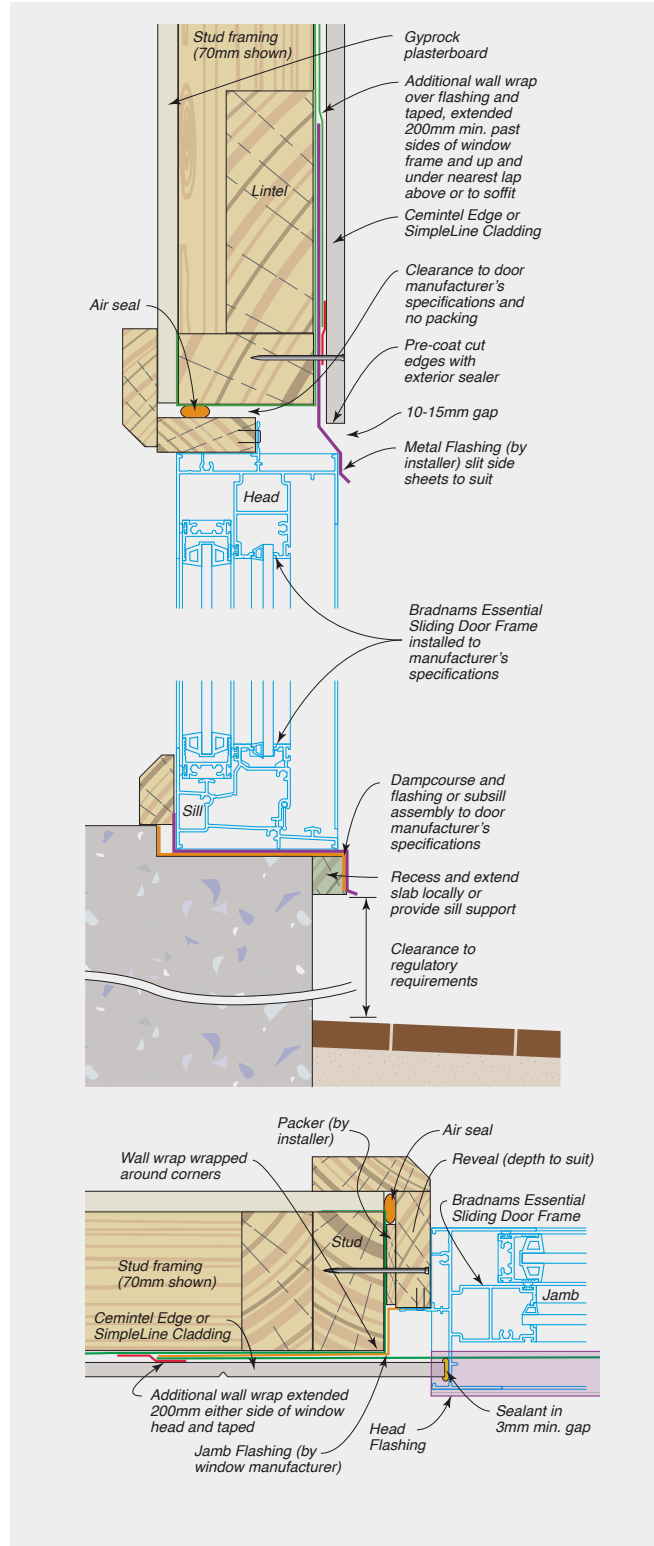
Typical Sliding Door Installation – 70mm Framing Shown
